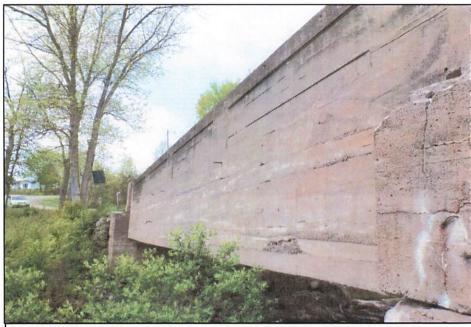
South Exterior Fascia and Barrier Wall Looking West
